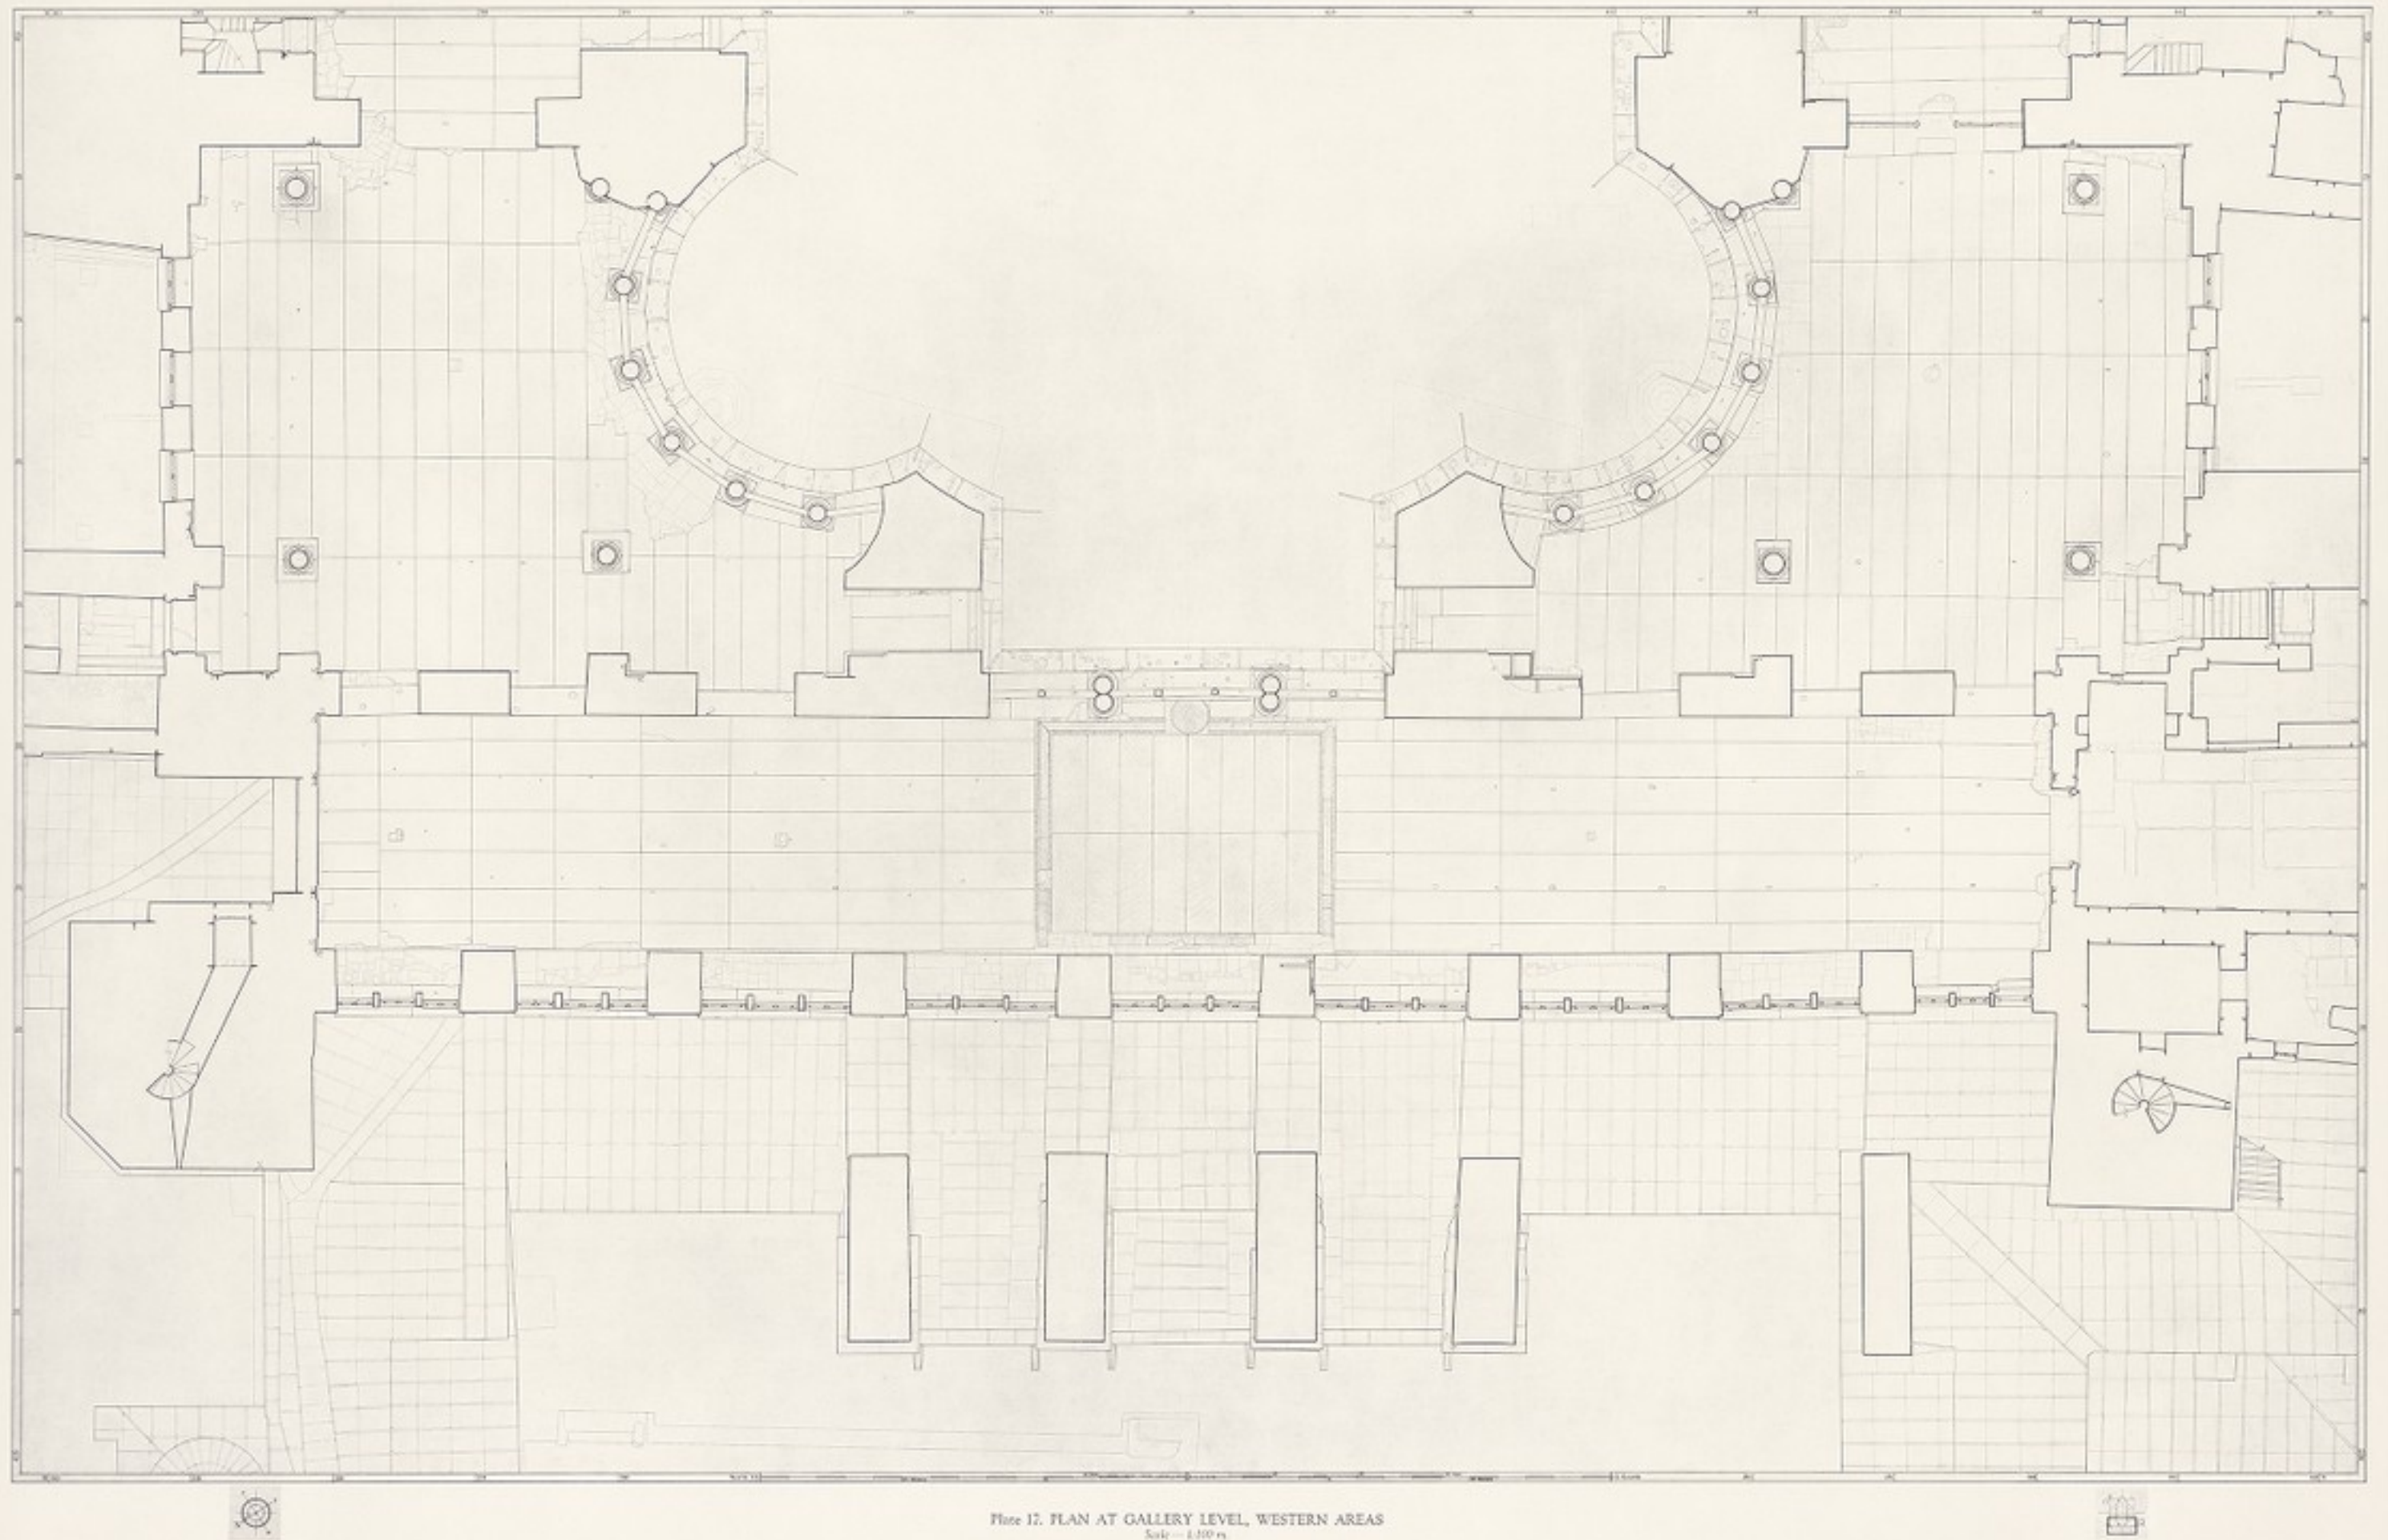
PLAN AT GALLERY LEVEL, WESTERN AREAS
